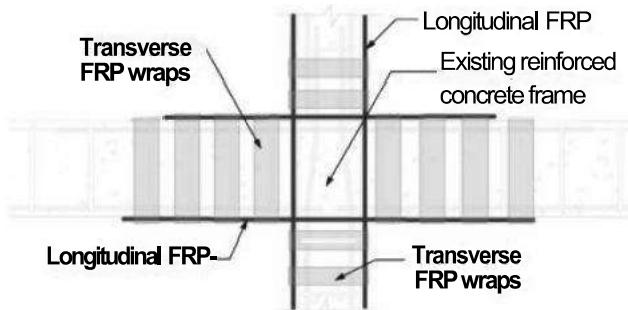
Conceptual FRP strengthening detail(cross section elevation)
